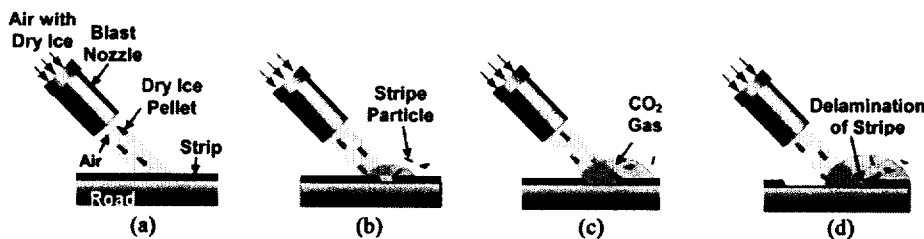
Principle of CO₂ Blaster: (a) Pellets Shot at Stripe, (b) Pellets Fracking Paint, (c) Pellets Explode into Gas, (d) Thermal Shock Separates Stripe
